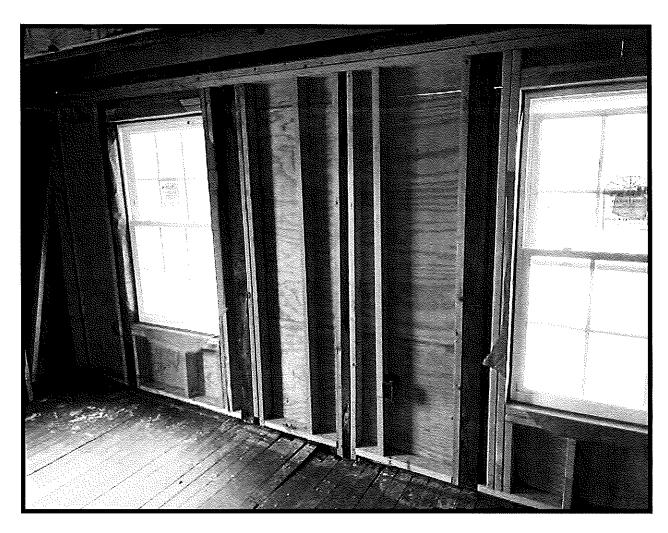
Significantly modified/reinforced stud walls/structural sheathing & new windows.
